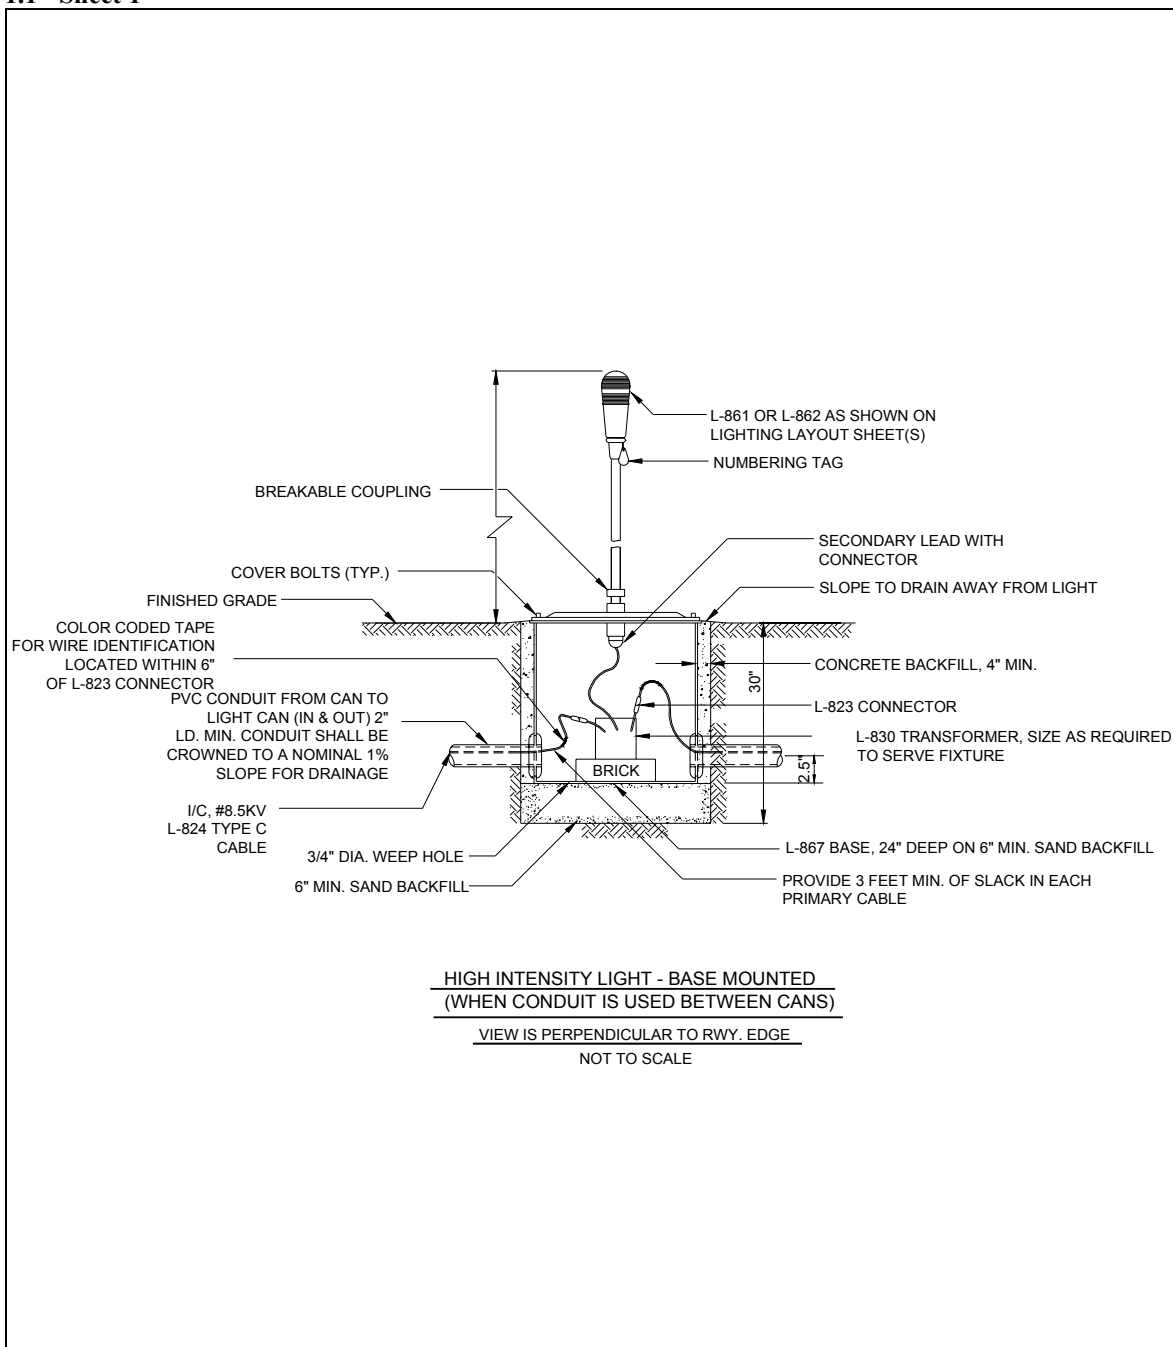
Typical Standard Details for Runway & Taxiway Edge Lights – GL-600 Sheet 1A – High Intensity Light – Base Mounted
